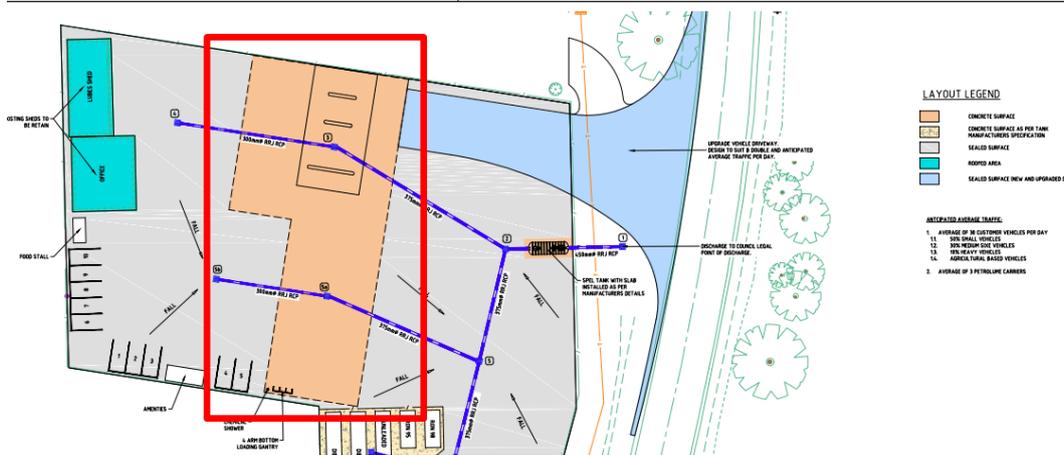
Image extracted from Layout Plan – showing proposed surface types
